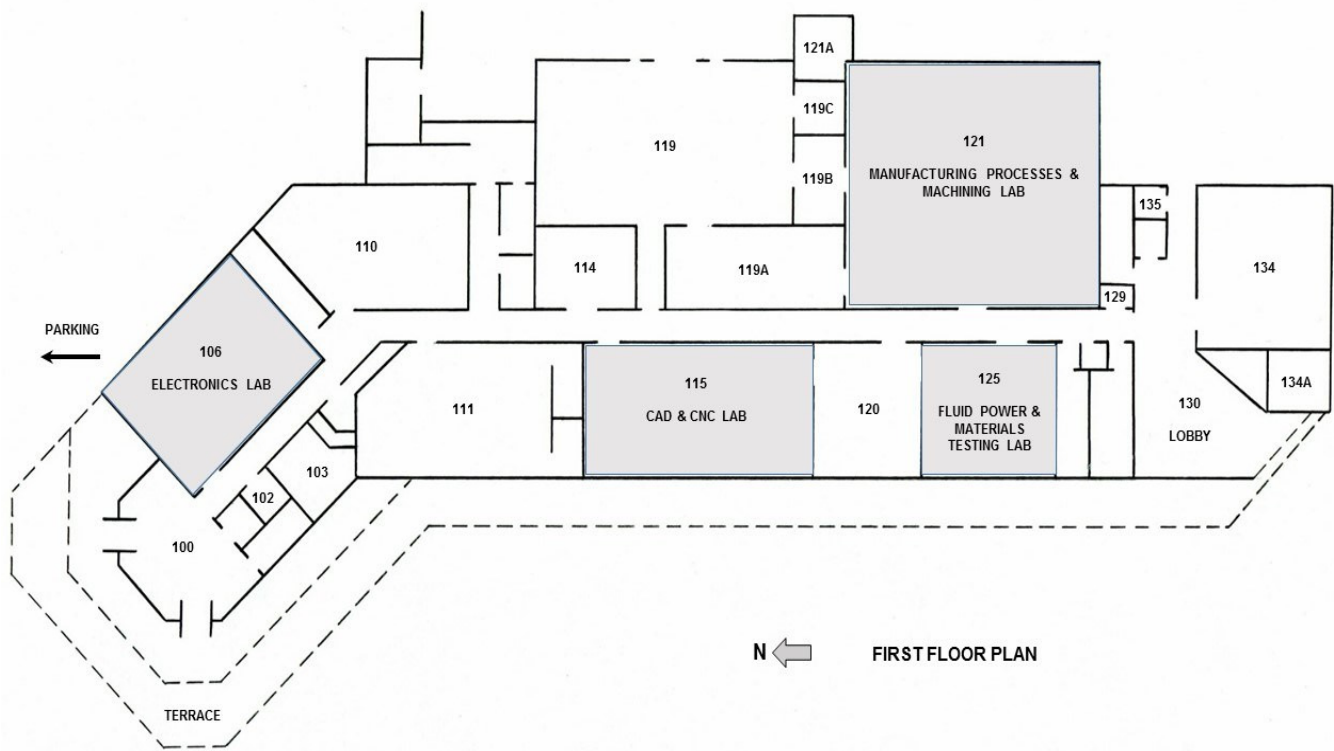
First Floor of the BC Building (lab spaces are shaded)
